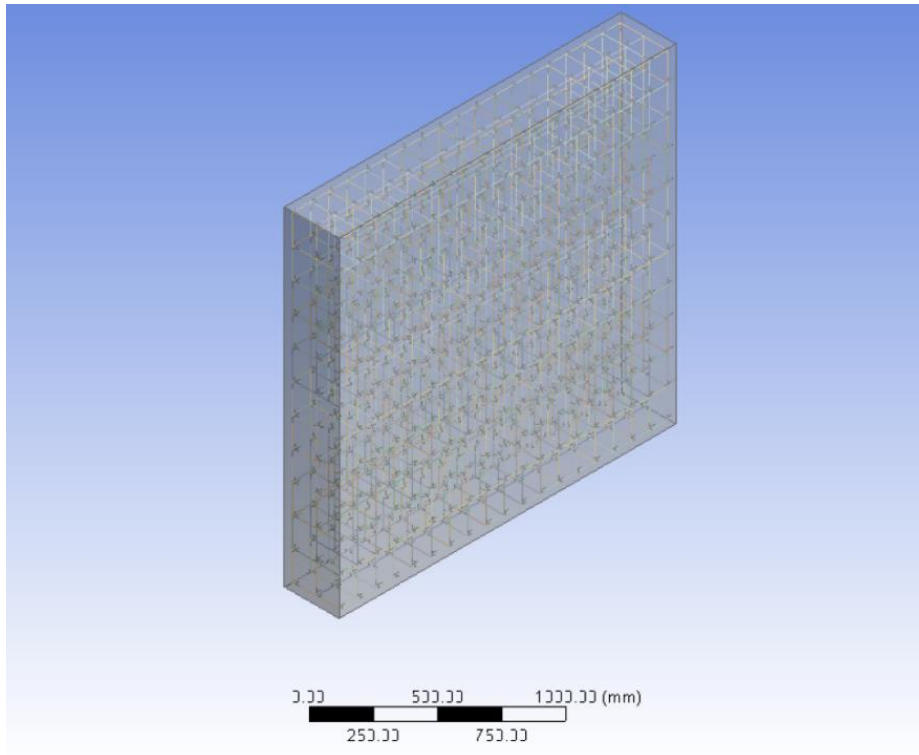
Reinforced Concrete Wall with Steel Bars in 3D Model.
